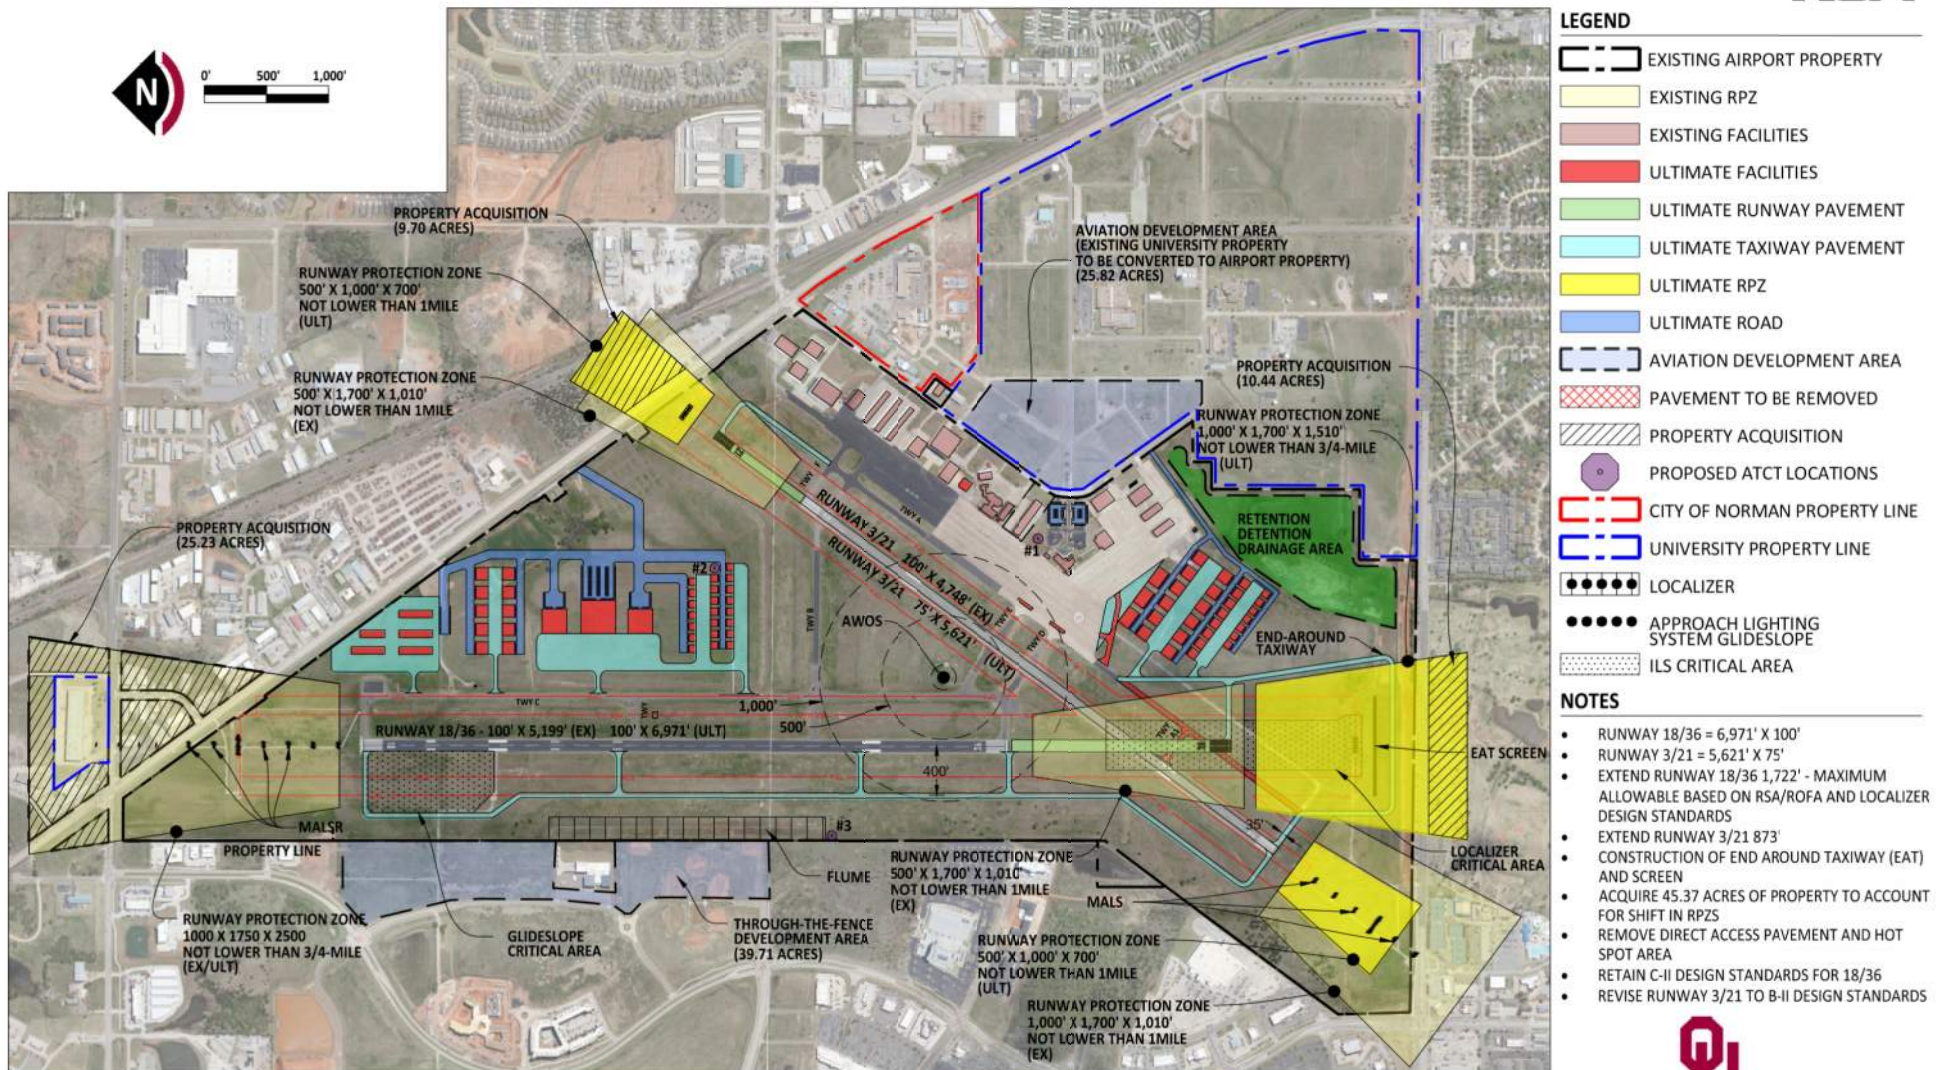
RECOMMENDED DEVELOPMENT PLAN
